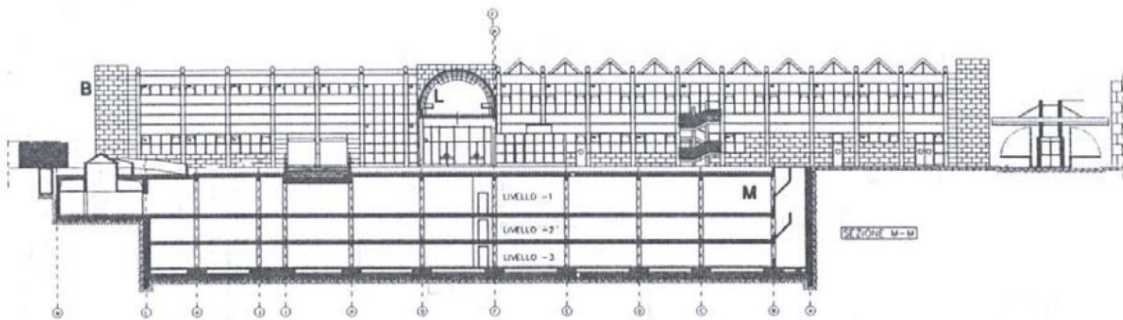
Longitudinal section of the underground garage to service of the Banca Popolare di Milano
